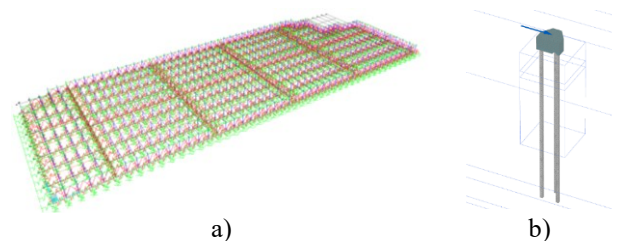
a) Foundation's structure 3D SAP2000 finite element model. b) Pile Plaxis 3D finite element model.
